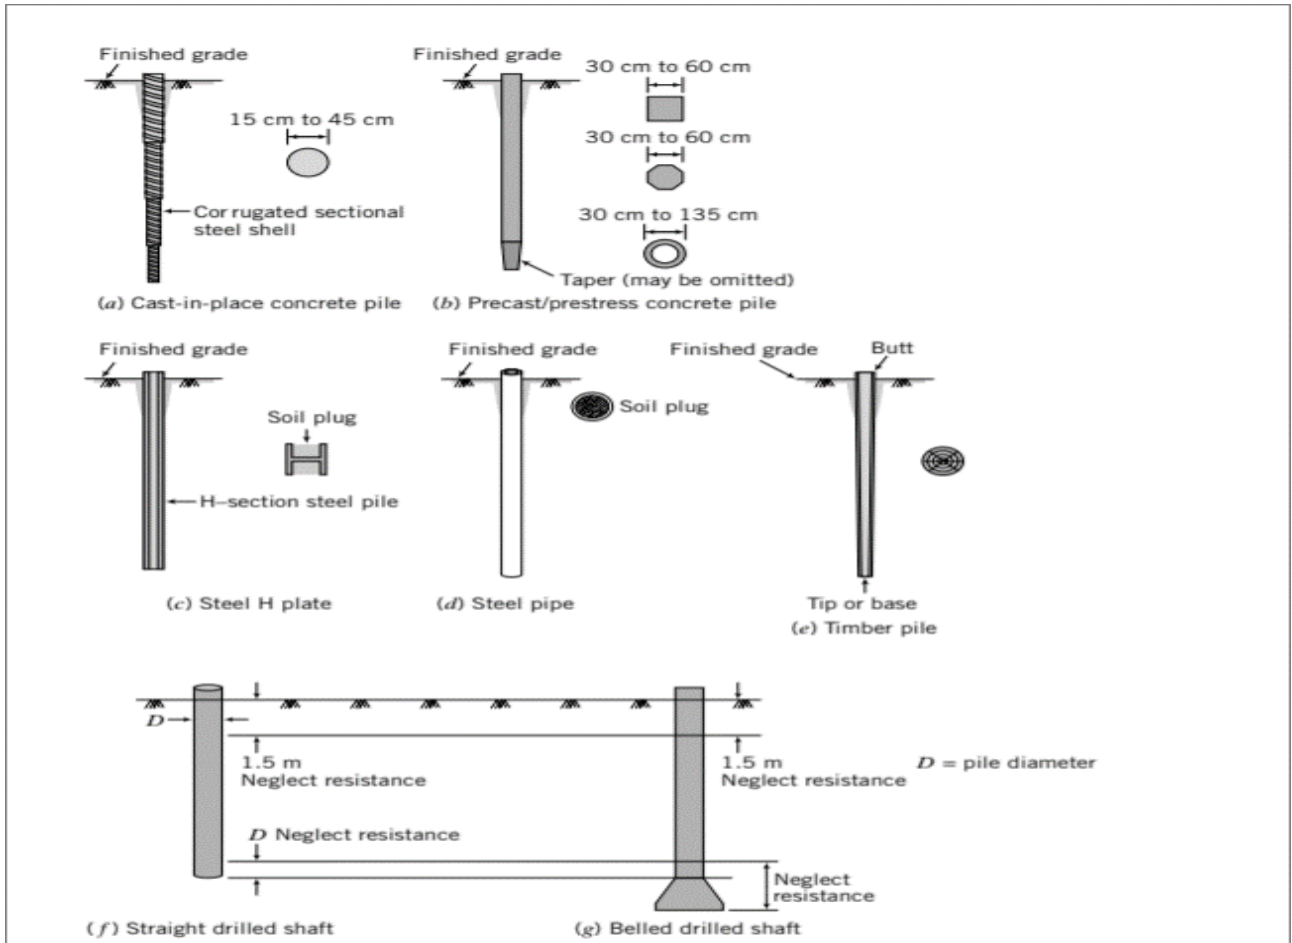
Types of piles: a) Cast-in-situ concrete pile b) Precast concrete pile c) steel pile (H-section) d) steel pipe (circle section) e) timber pile[9]
